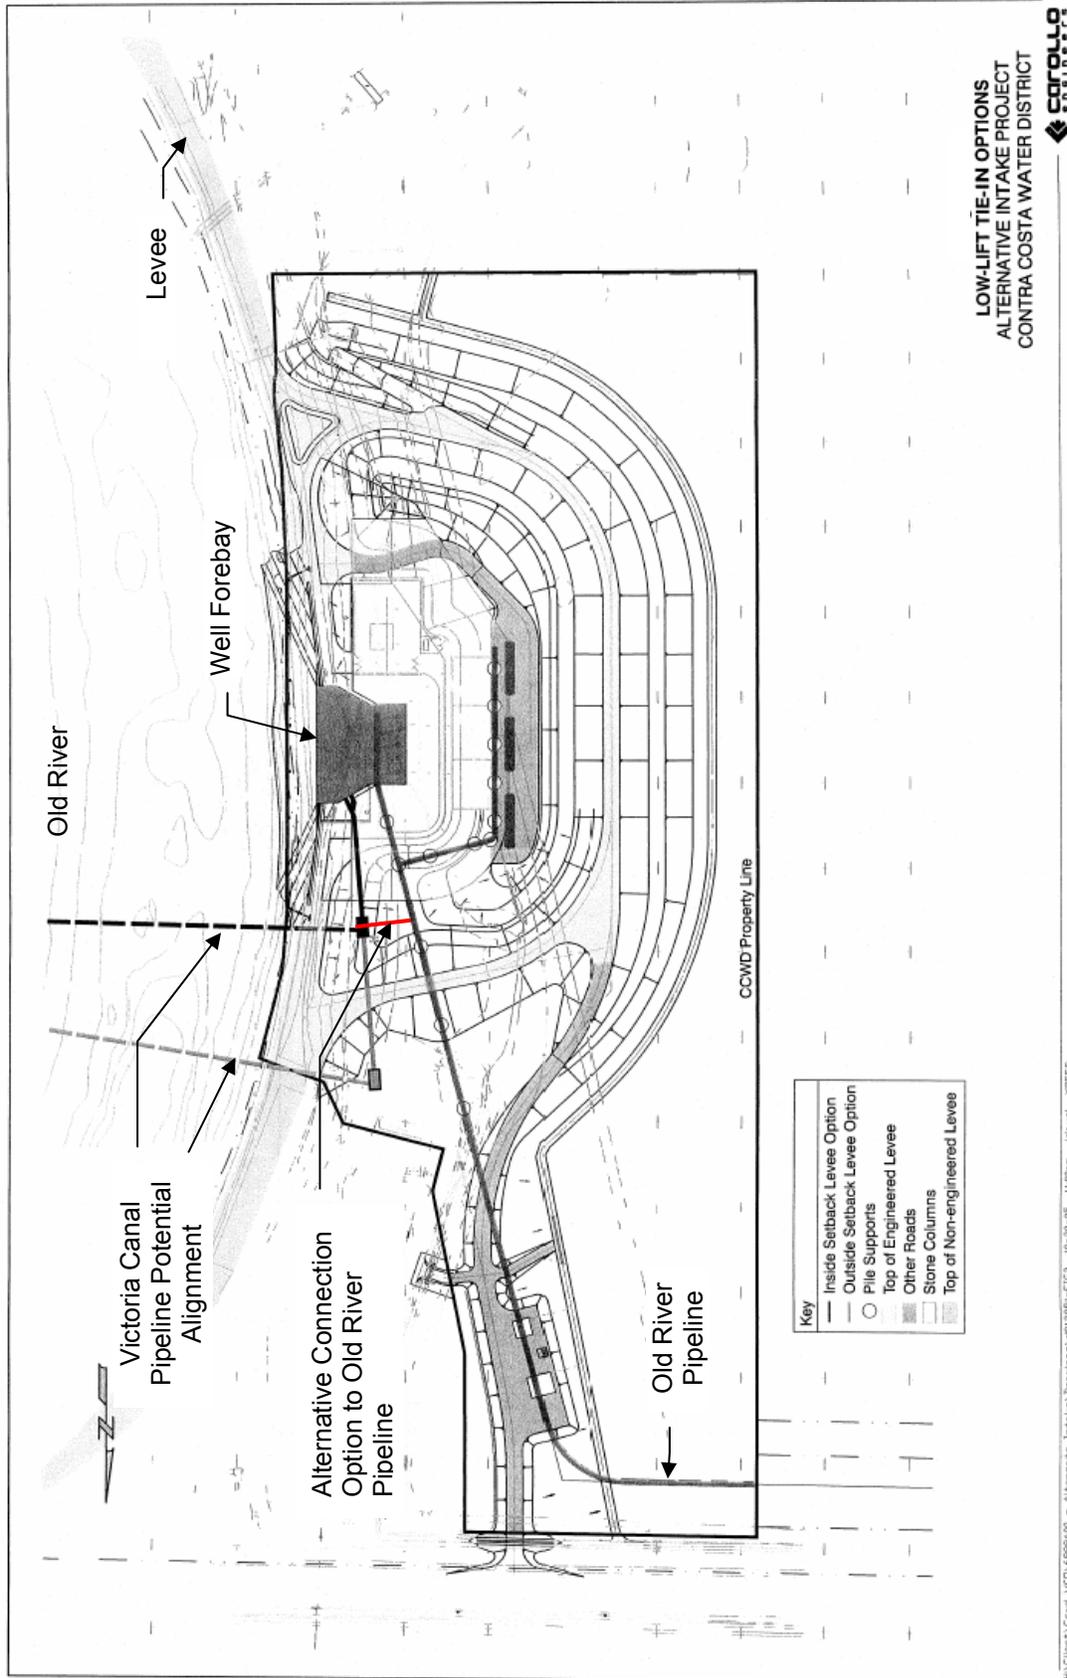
Plan 1 – Old River Crossing for Victoria Canal Pipeline
